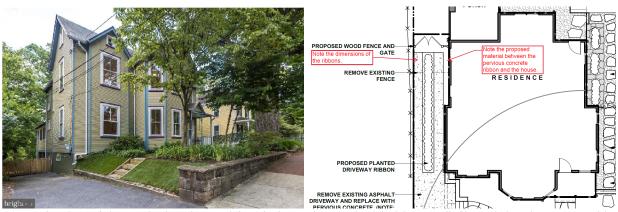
View of the north elevation and façade (west elevation) with driveway (left), and site plan proposed by applicant (right). The red outlined notes are materials requested by staff. Source: Montgomery Planning.
